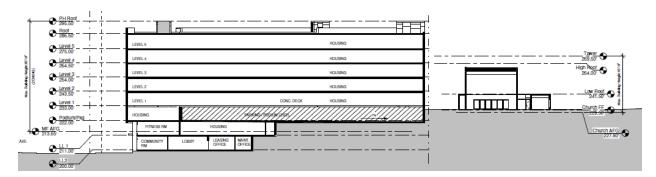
Rendering of the Multi-Family Building and Church building as seen from N. Beauregard Street (Northwest Elevation).
